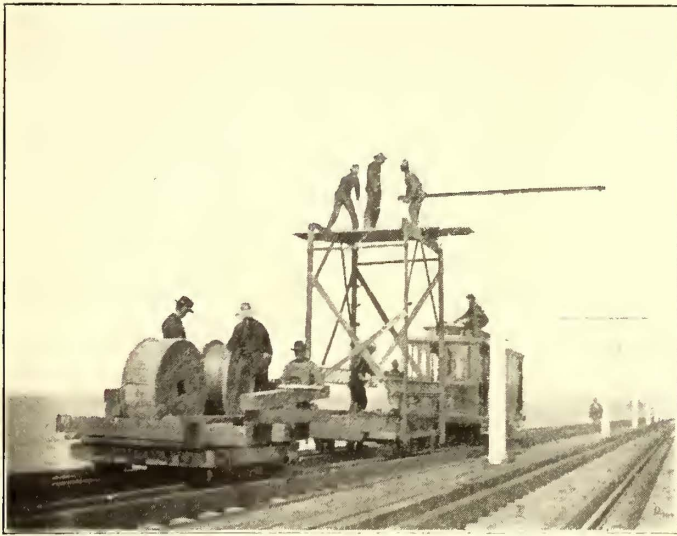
STRINGING TROLLEY WIRE ON PIER
